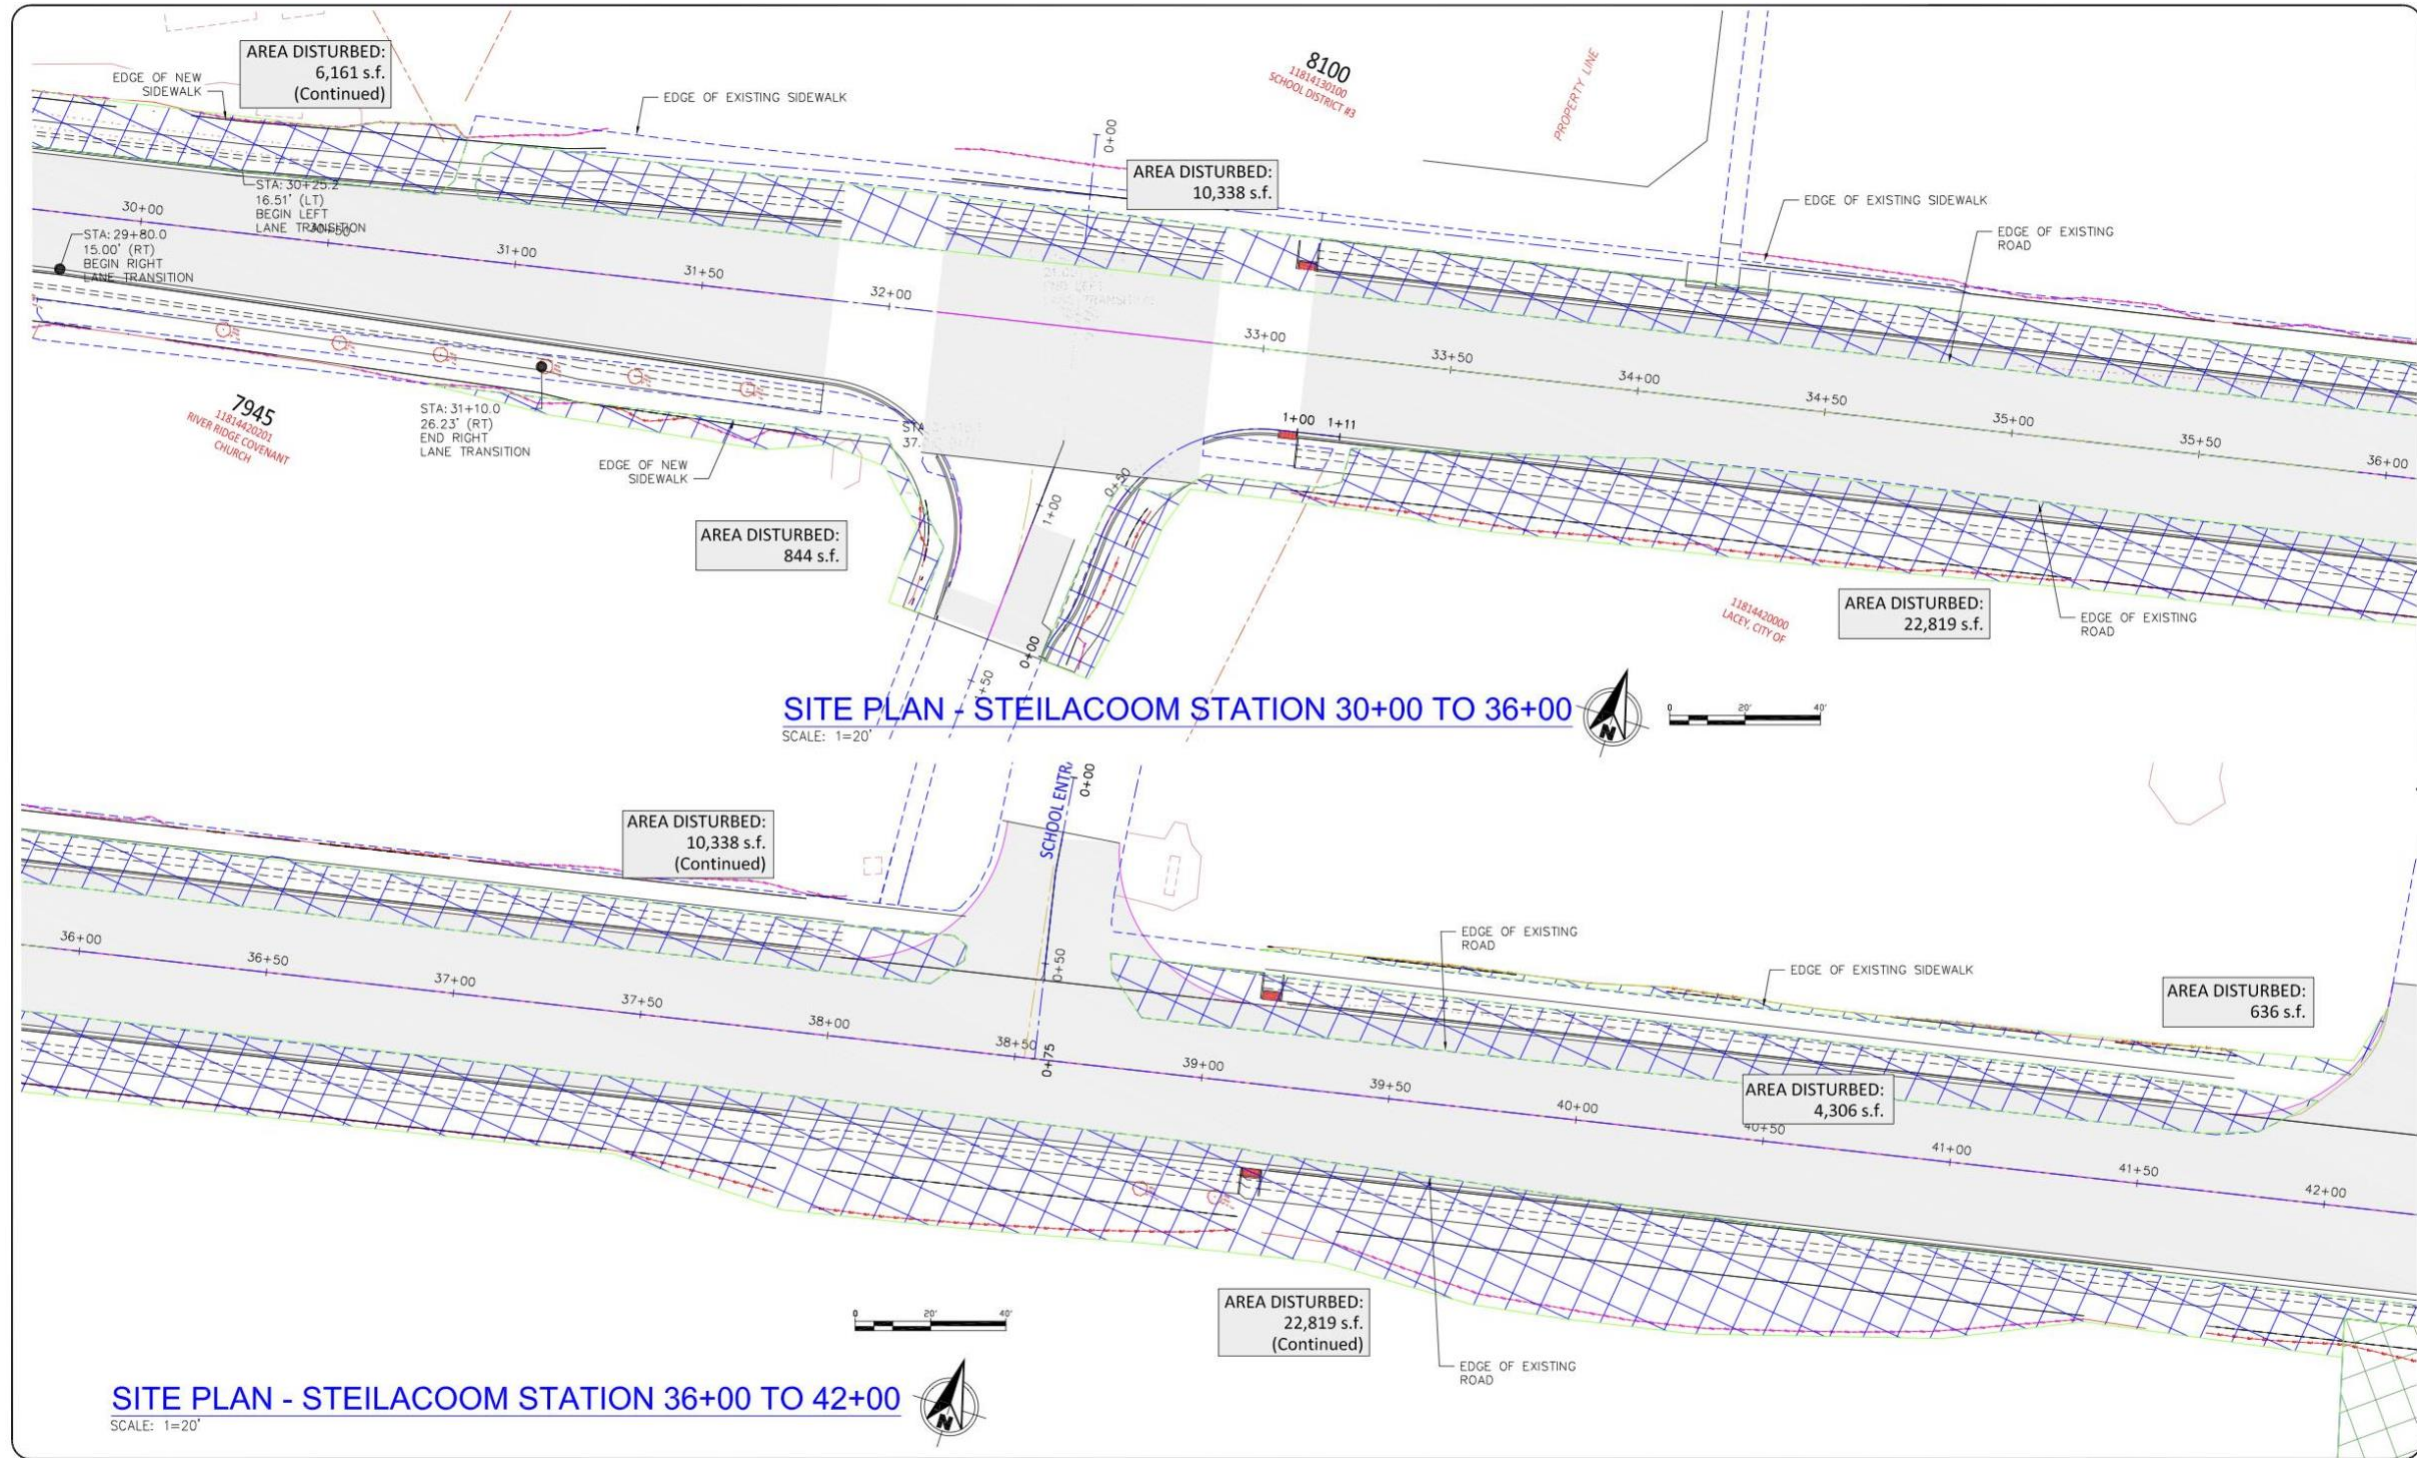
Steilacoom Road Site Plan Drawing – Sheet 3 of 5
